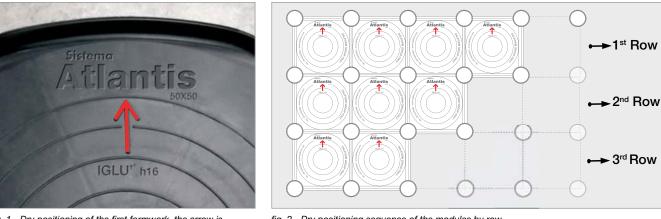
Dry positioning of the first formwork, the arrow is facing the foundation curb
